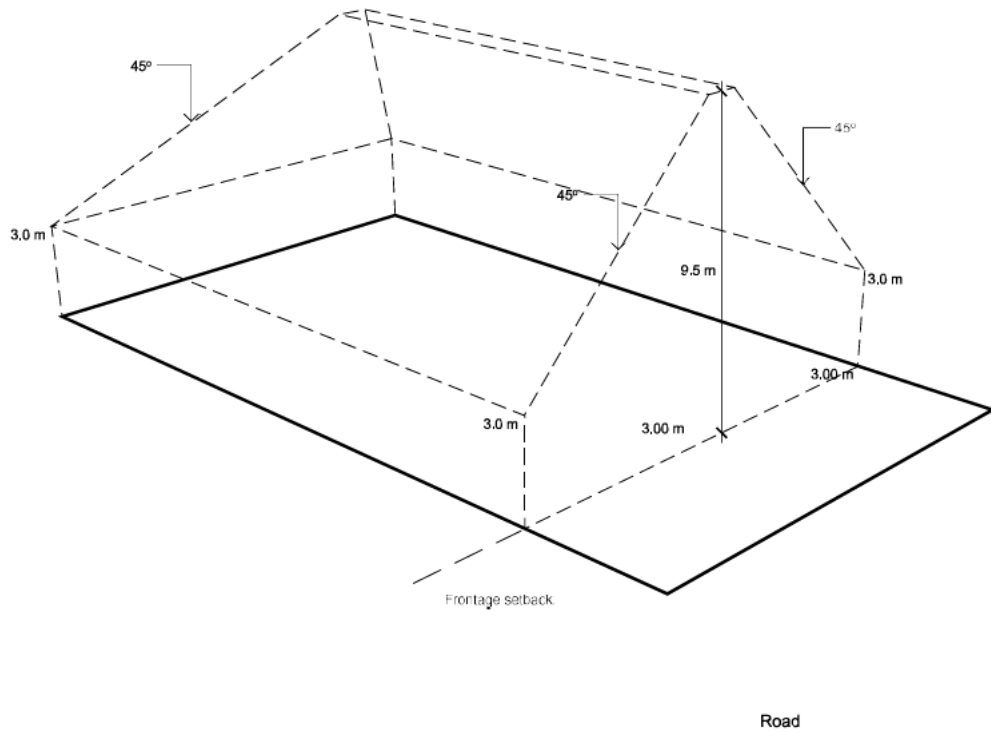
Building envelope for corner lots as required by clause BRI-S13.8.2 A3(a)
